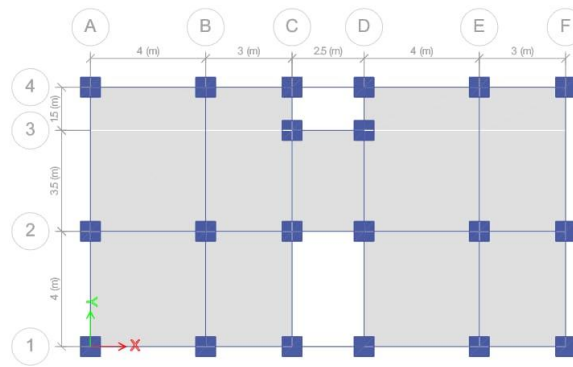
Plan View Showing the Column Grid Arrangement of the Symmetrical Structure
